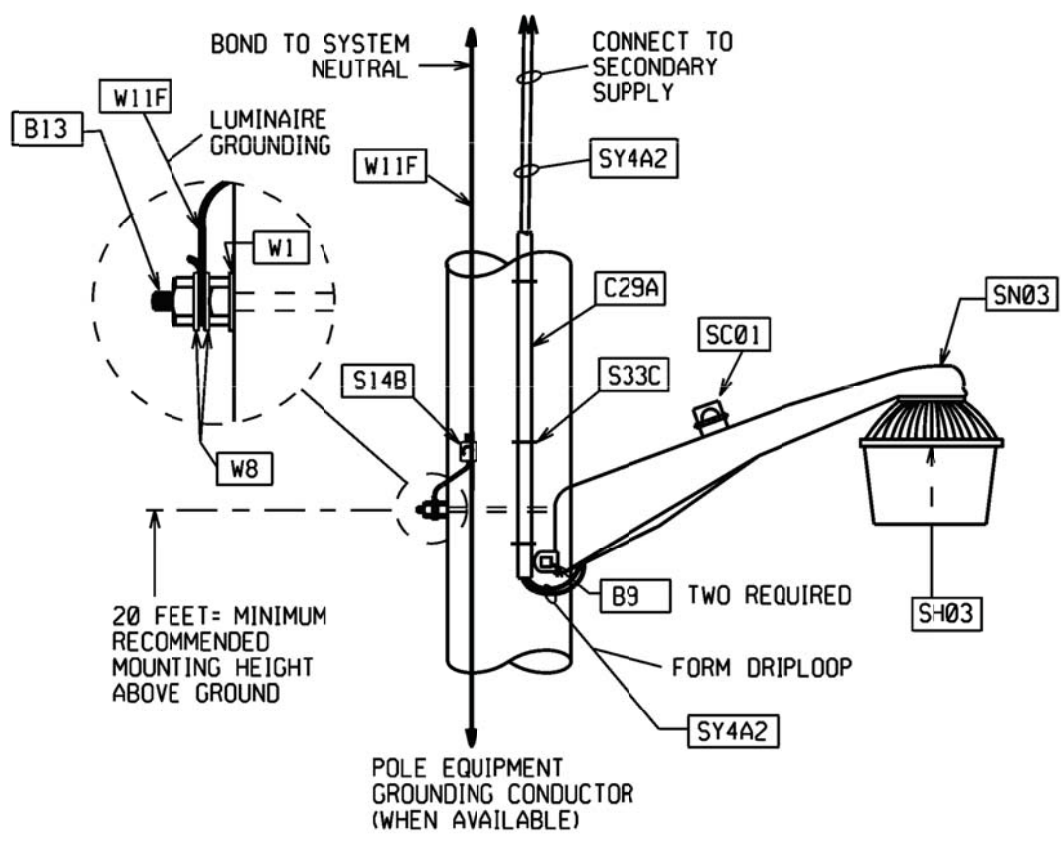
Residential Security Luminaire Installation on Wood Pole
